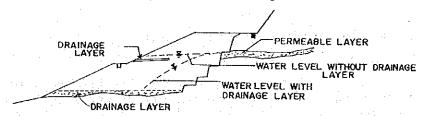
DRAINAGE FACILITIES FOR EMBANKMENT ON SLANTING GROUND
